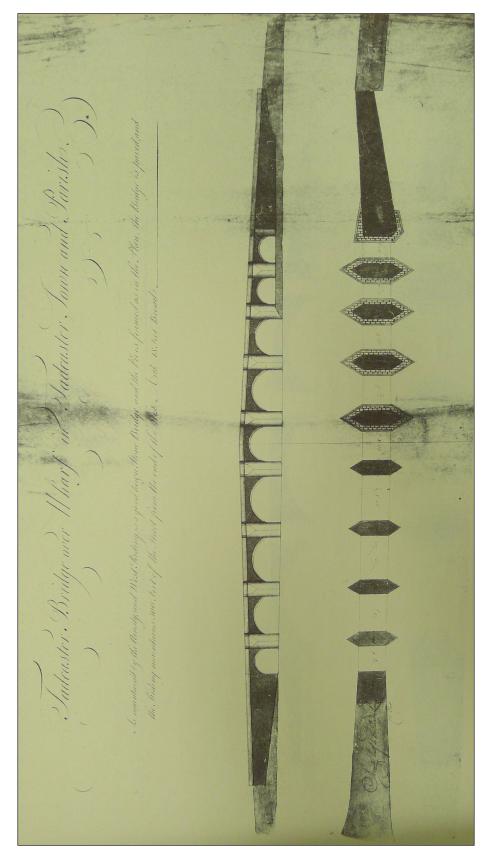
Plan and upstream elevation of Tadcaster Bridge as depicted in the 1752 West Riding Bridges Book. Arch 1 is to the left. (WYAS QD1/461. Reproduced by permission of West Yorkshire Archive Service, Wakefield, copyright reserved).
